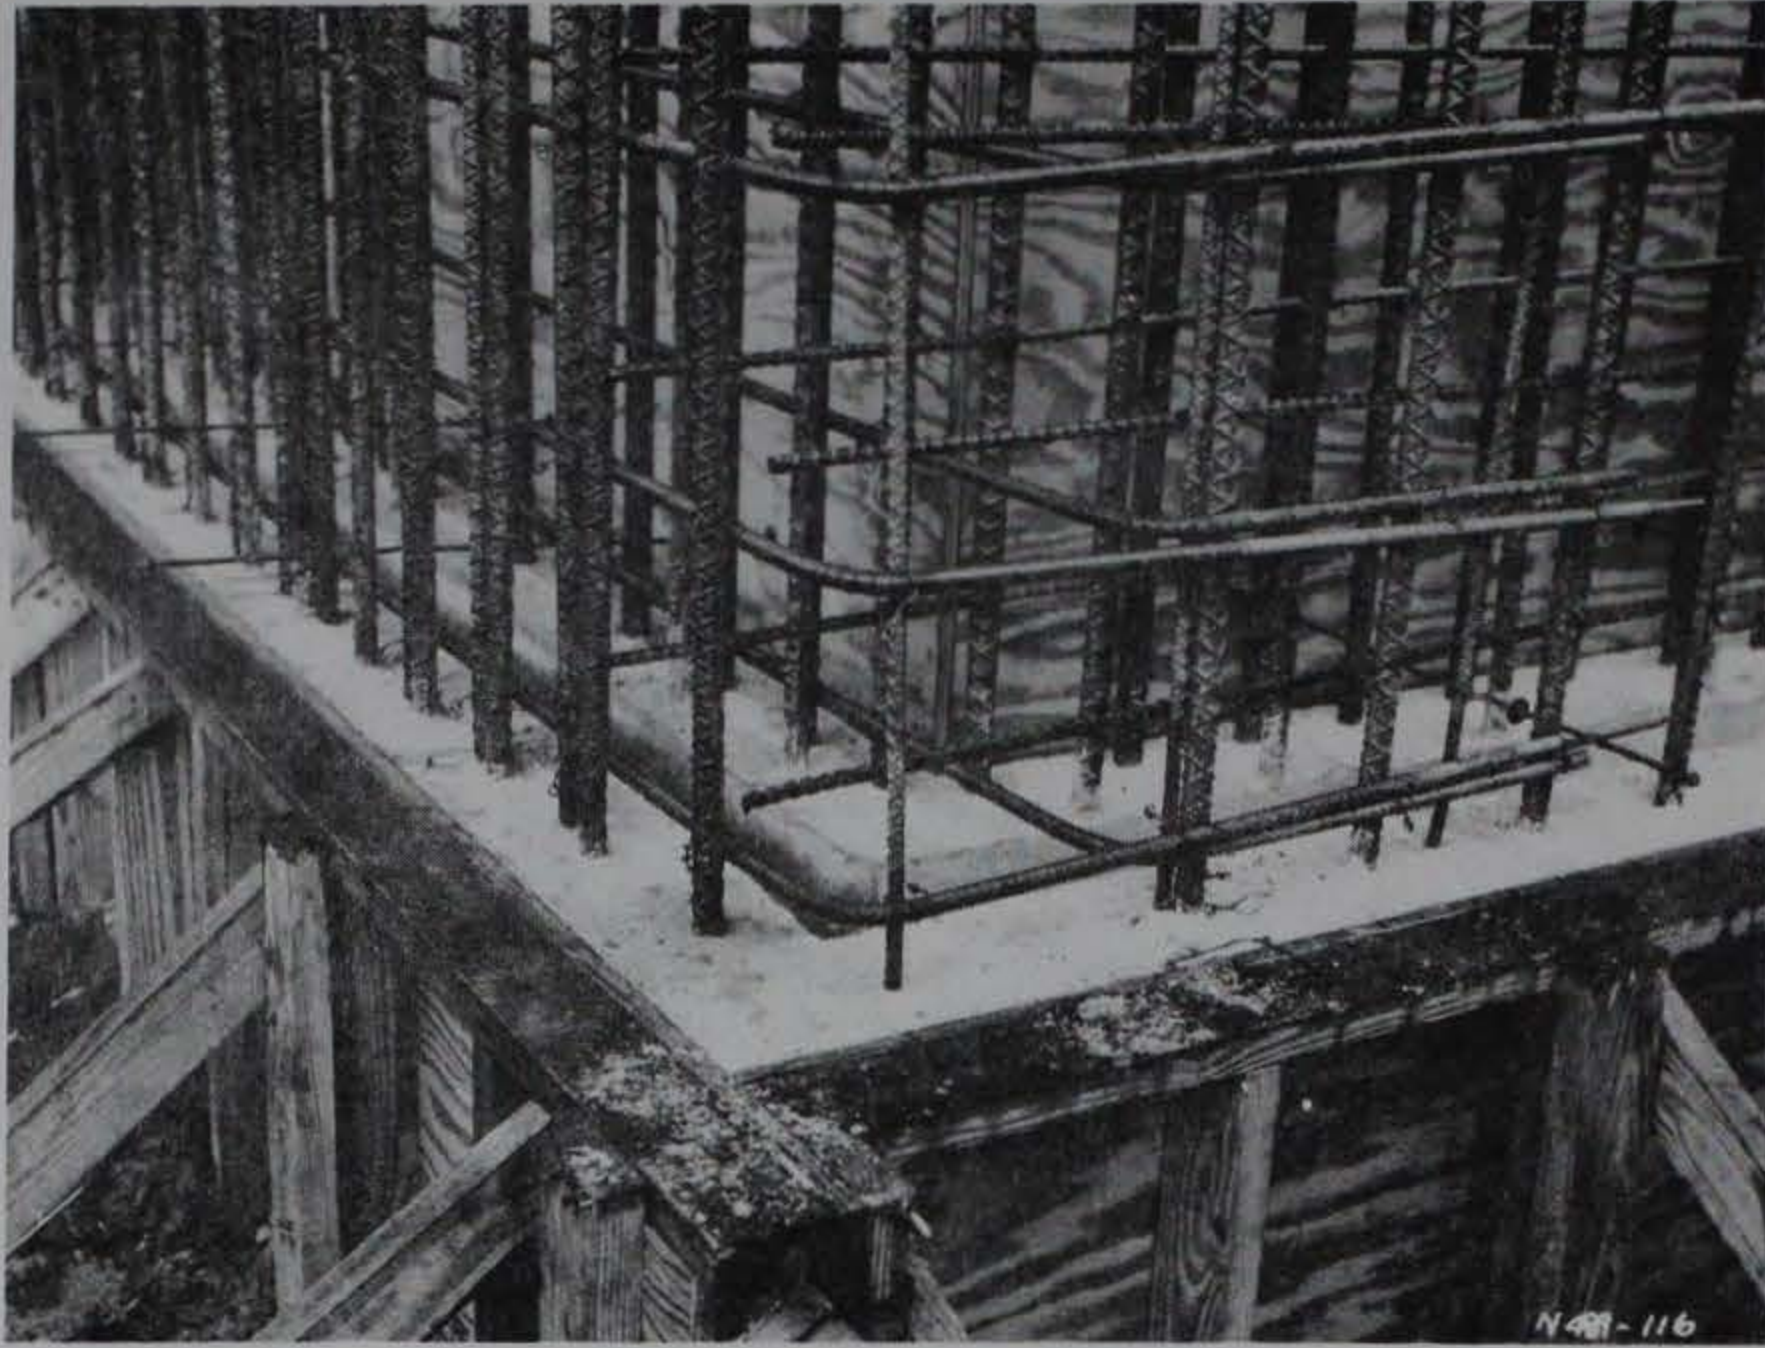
Corner reinforcing steel detail at base of acceptor bay wall.
